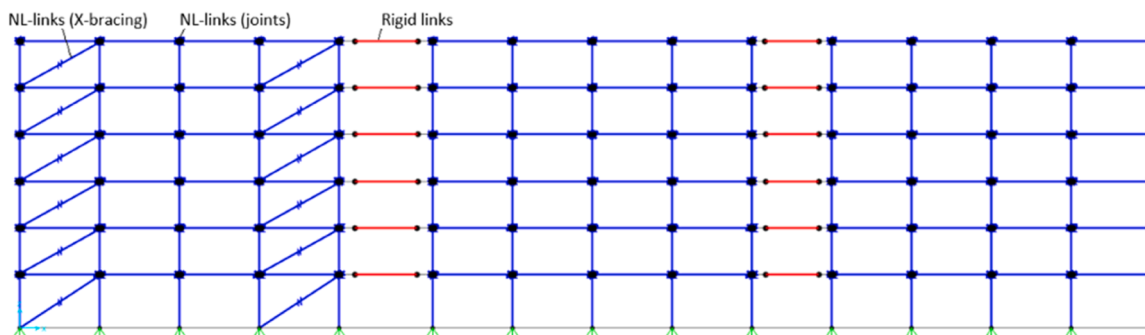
Numerical model of the steel-concrete composite frame with fully isolated slab (JB joint) and X-bracings (Sap2000).
